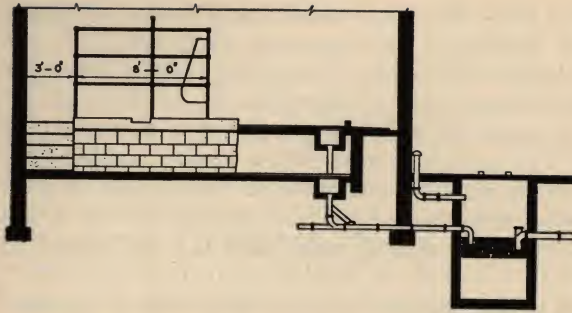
Milking parlor section showing drains and wash water disposal. The walls are shown as masonry but other suitable materials may be used.
